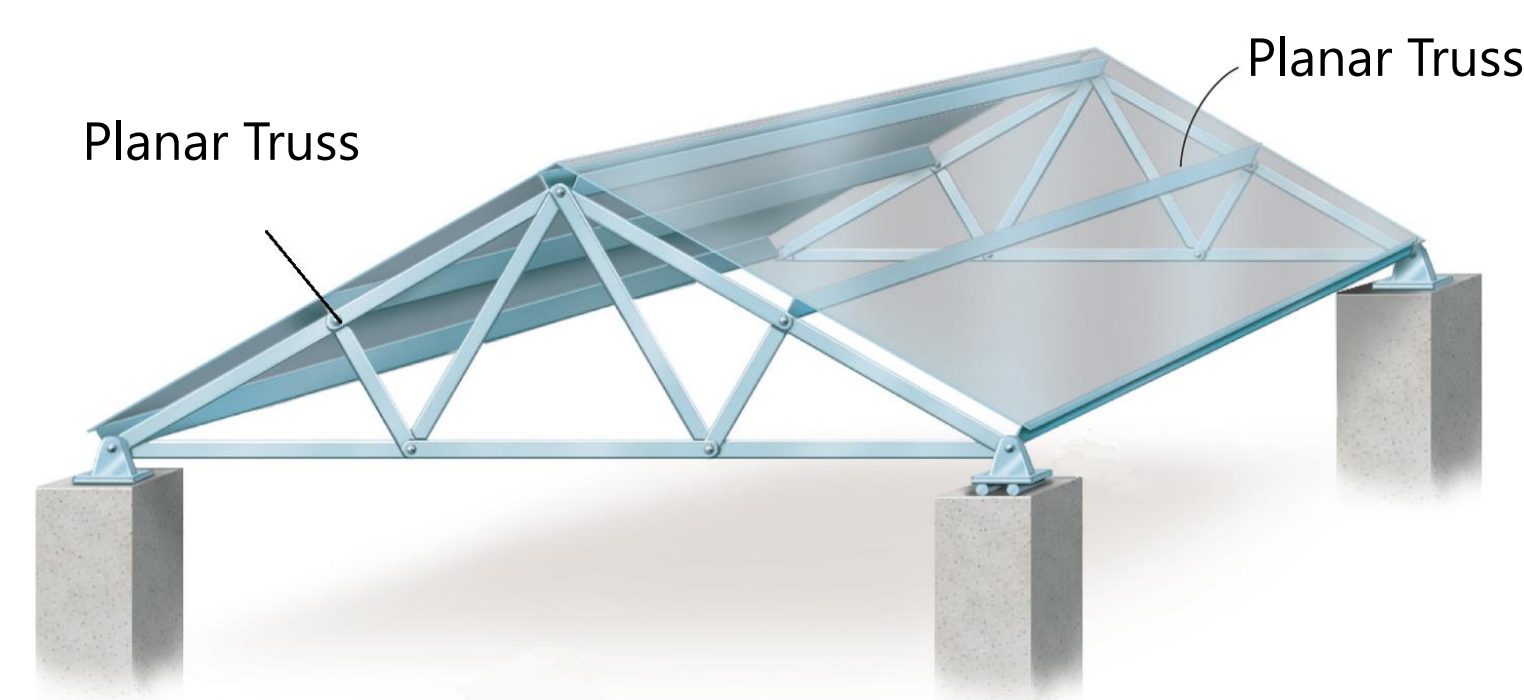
Examples of Planar Trusses in Roof Systems [1]
